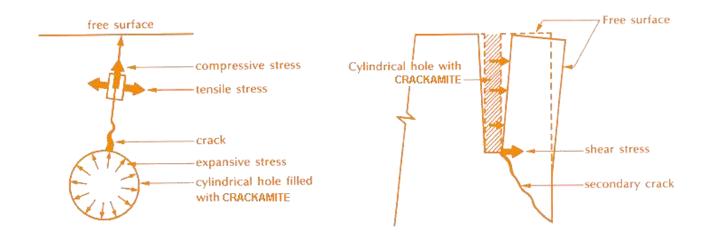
Fracture mechanism due to expansive stress generated by Crackamite
